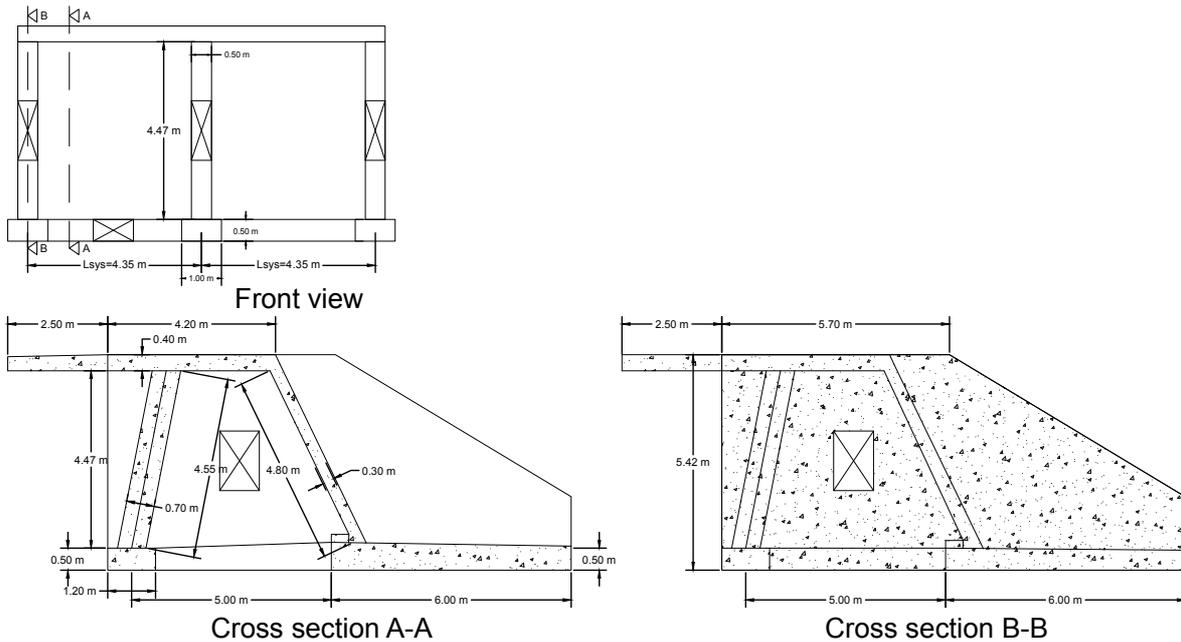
overall overview of the superstructure front view and cross section A-A and B-B
